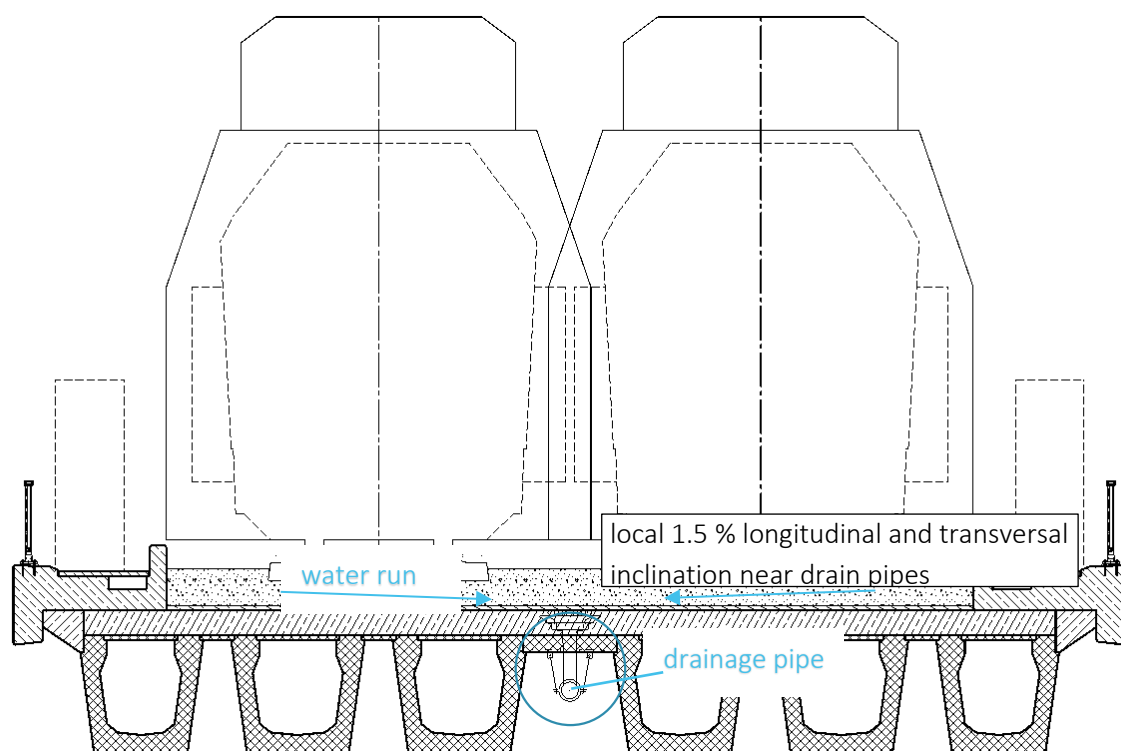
drainage system in cross section; Case 2 - Railway Viaduct –
